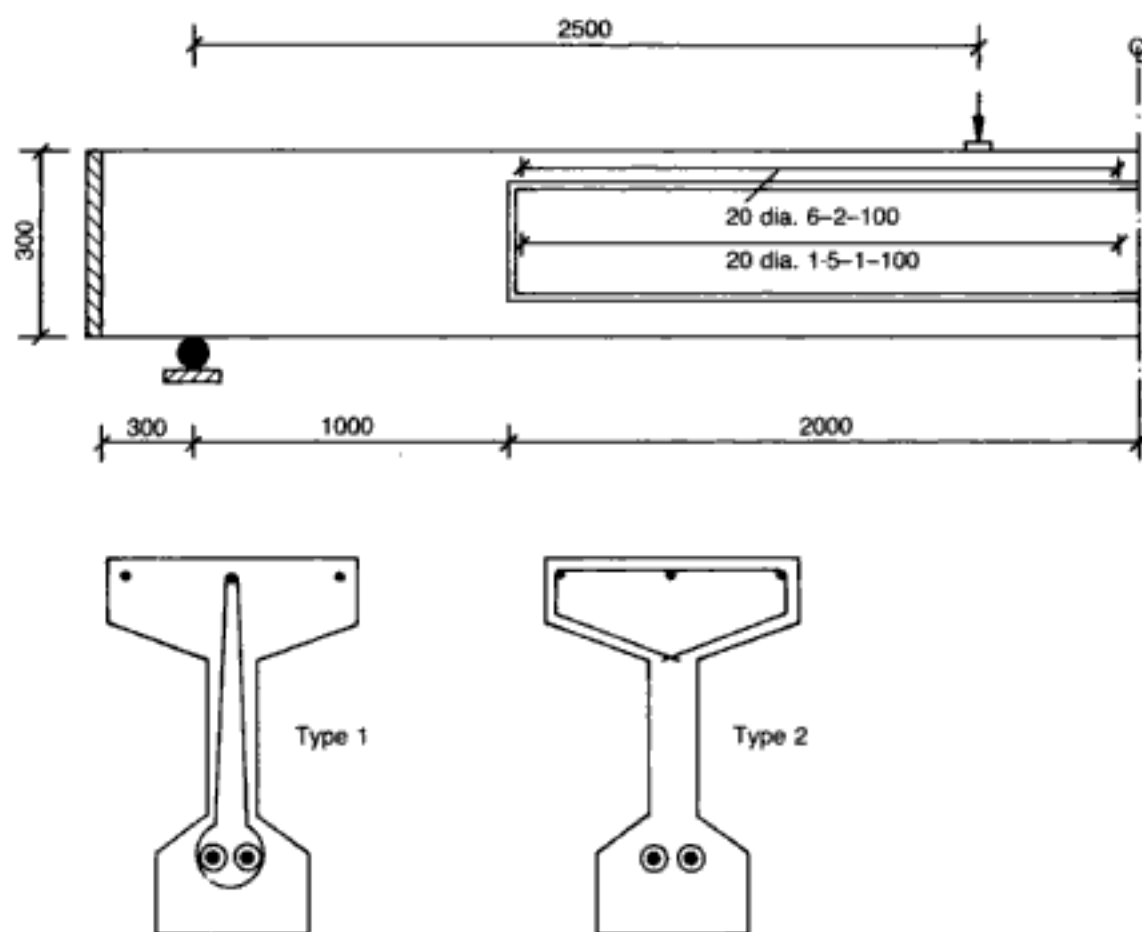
Beam PCB1. Transverse reinforcement details (all dimensions in mm)^{178,182}
